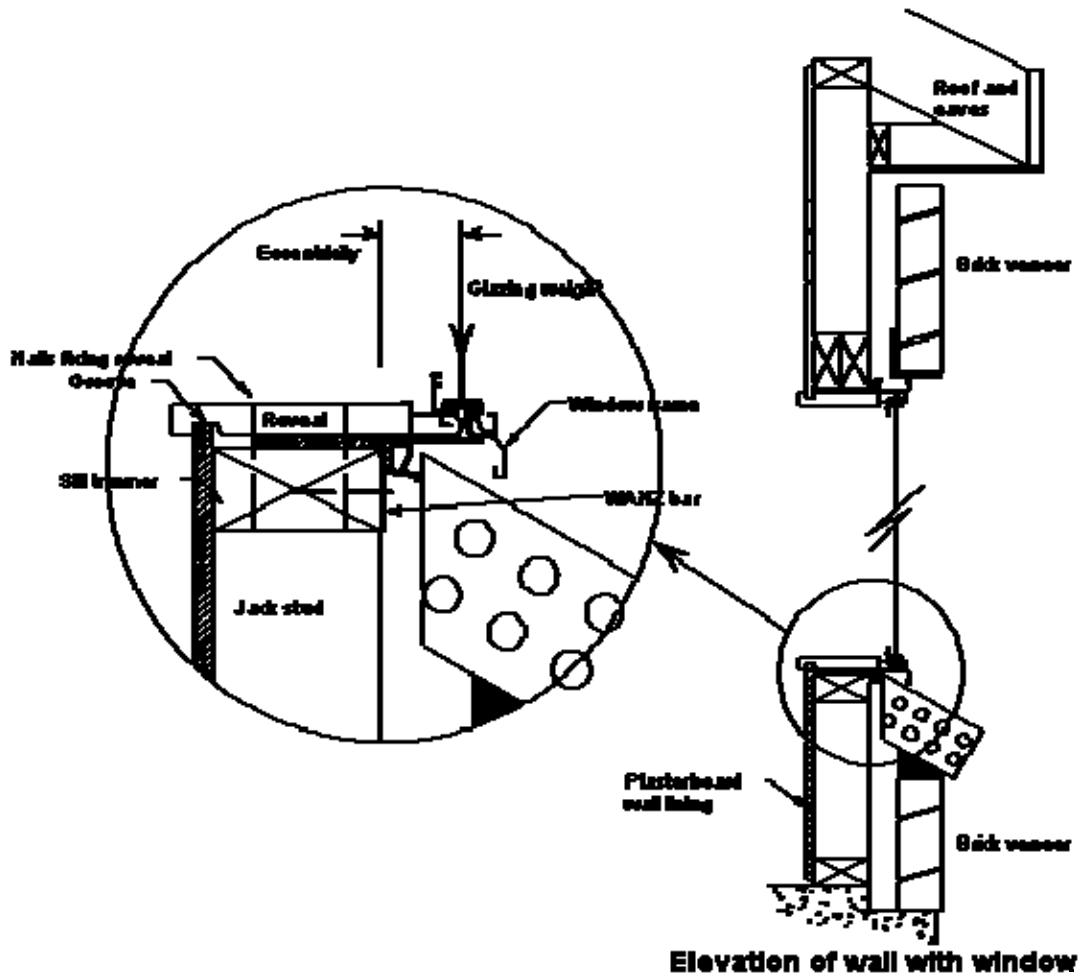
Cross-sectional elevation of a window in a brick veneer wall
